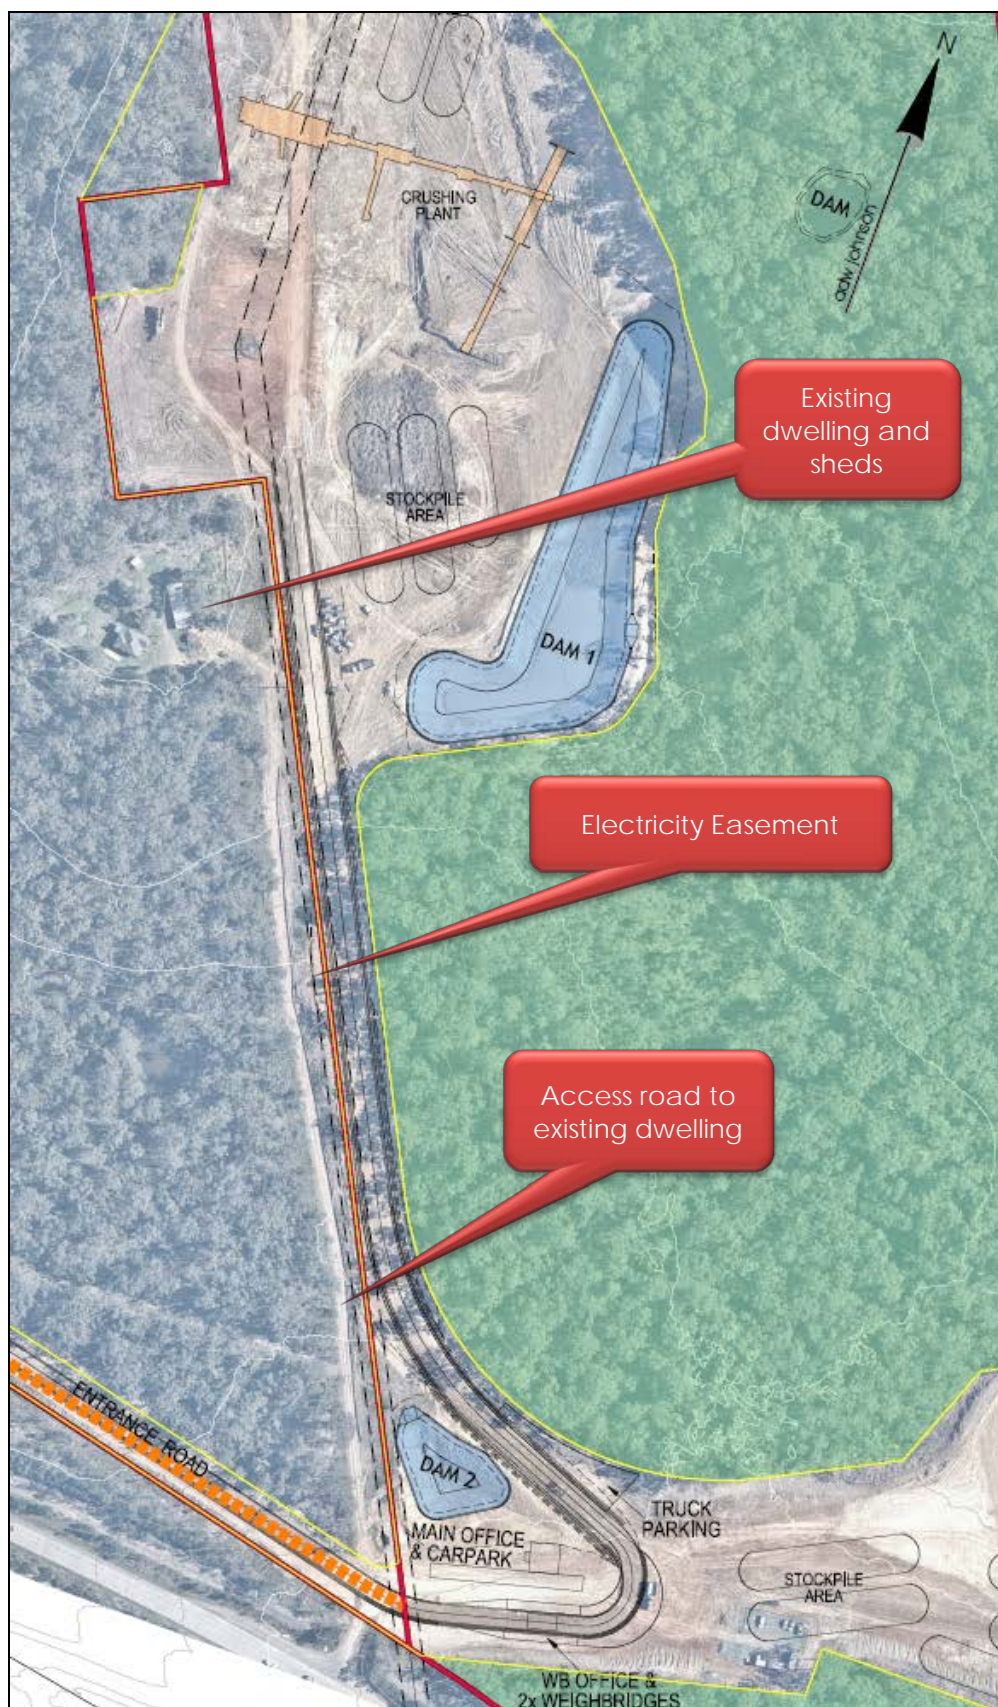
Aerial Photograph – Existing Site of Proposed MOD 2 and Surrounds.
